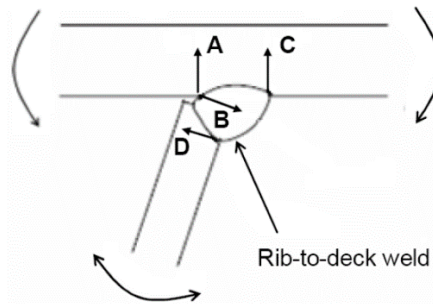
Potential fatigue cracks for the rib-to-deck joint; (A) root-deck cracking, (B) root-weld cracking, (C) toe-deck cracking, (D) toe-rib cracking (FHWA, 2012).
